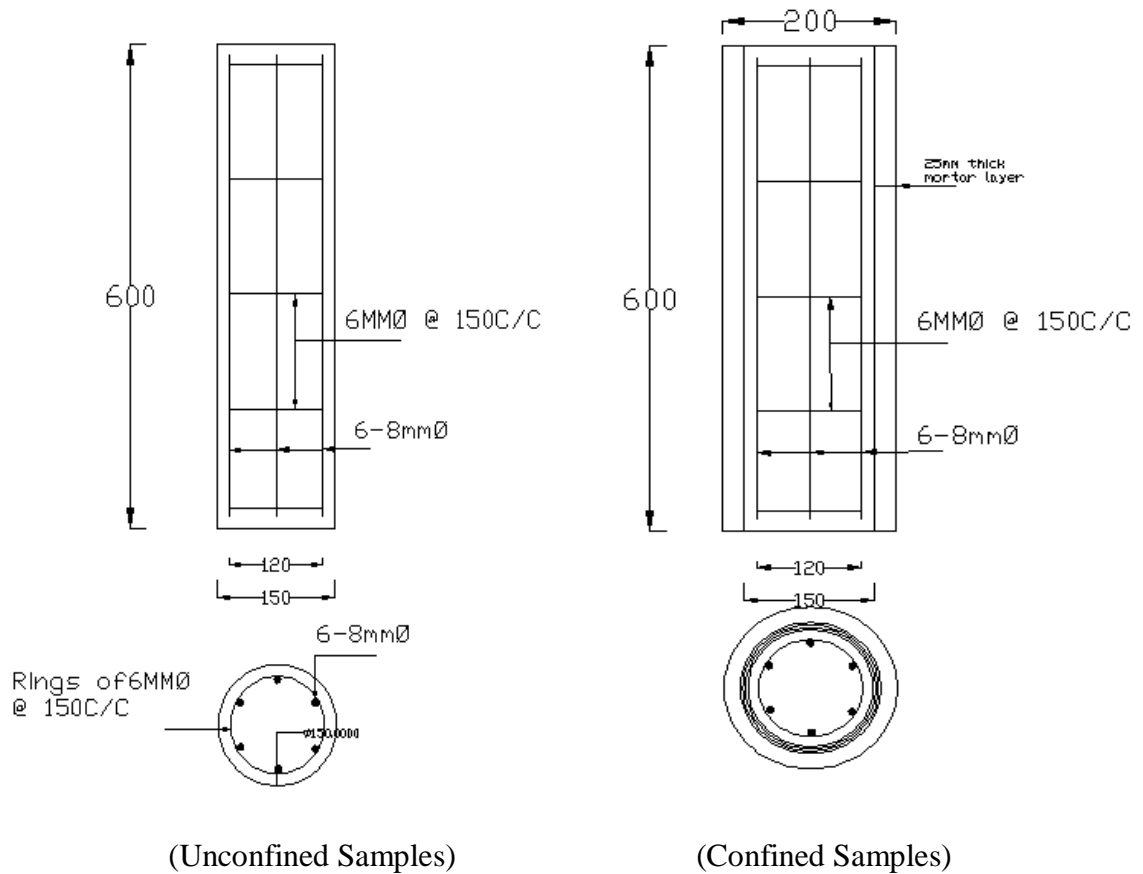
Reinforcement Details of Confined and Unconfined Cylindrical Columns
